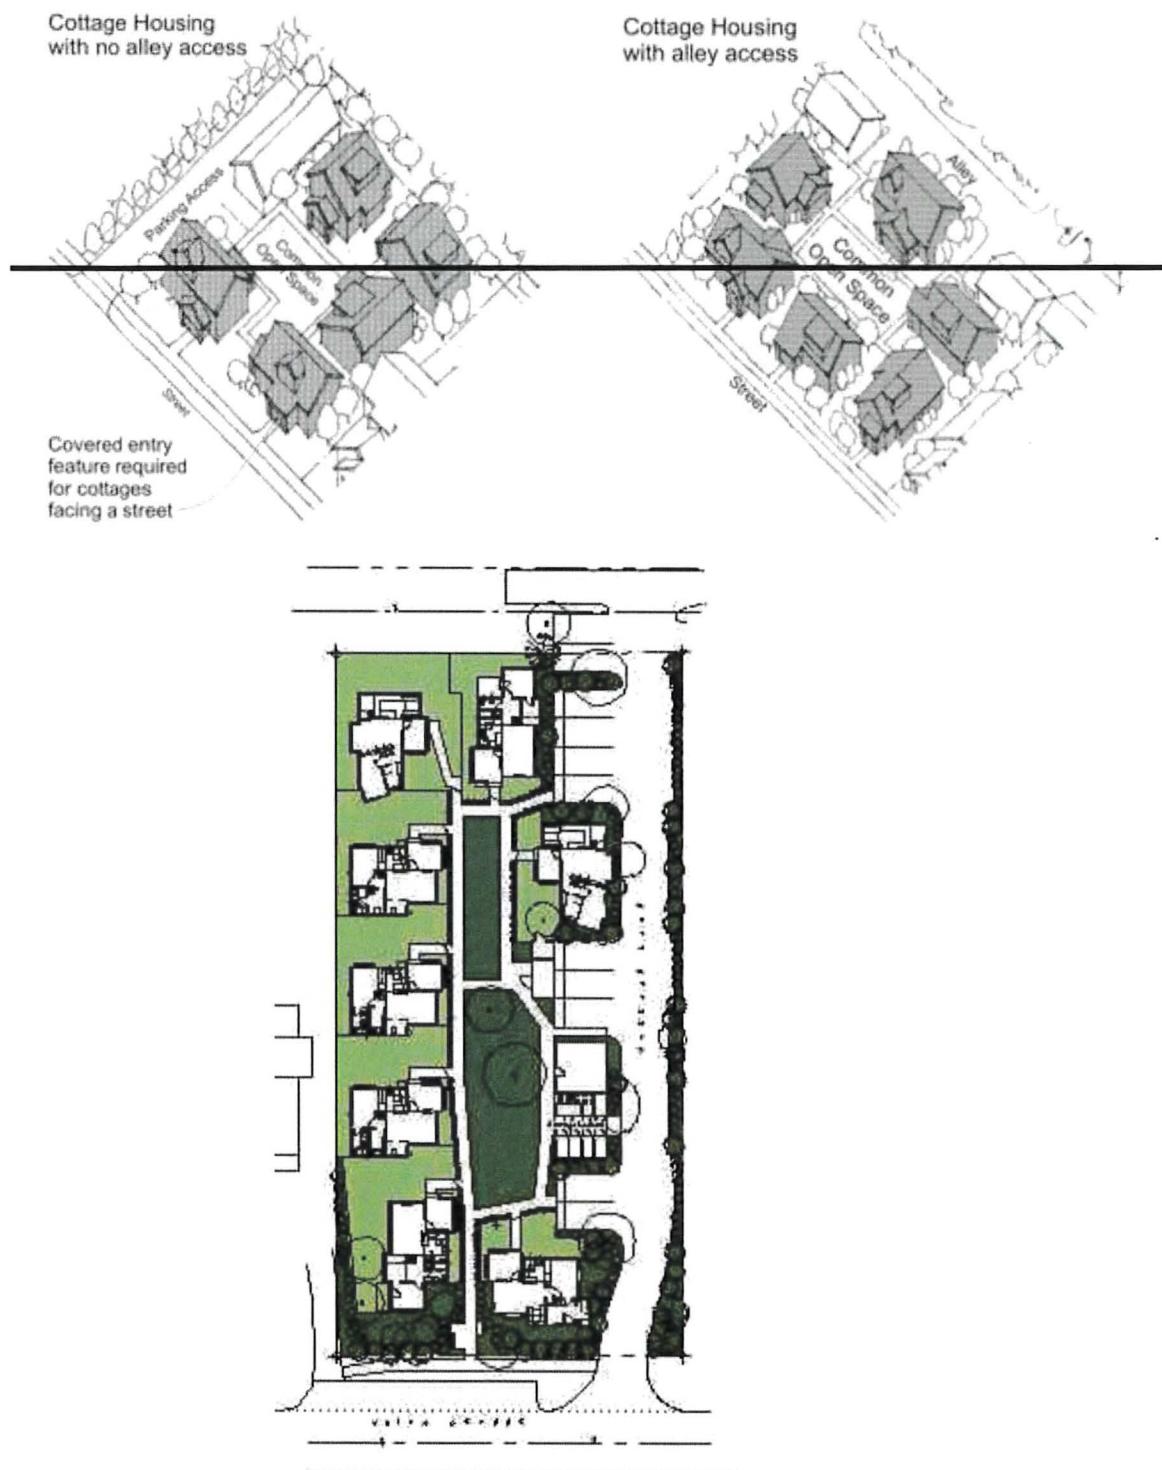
(MK)(1). Typical Sample cottage housing layouts – Example 1.
